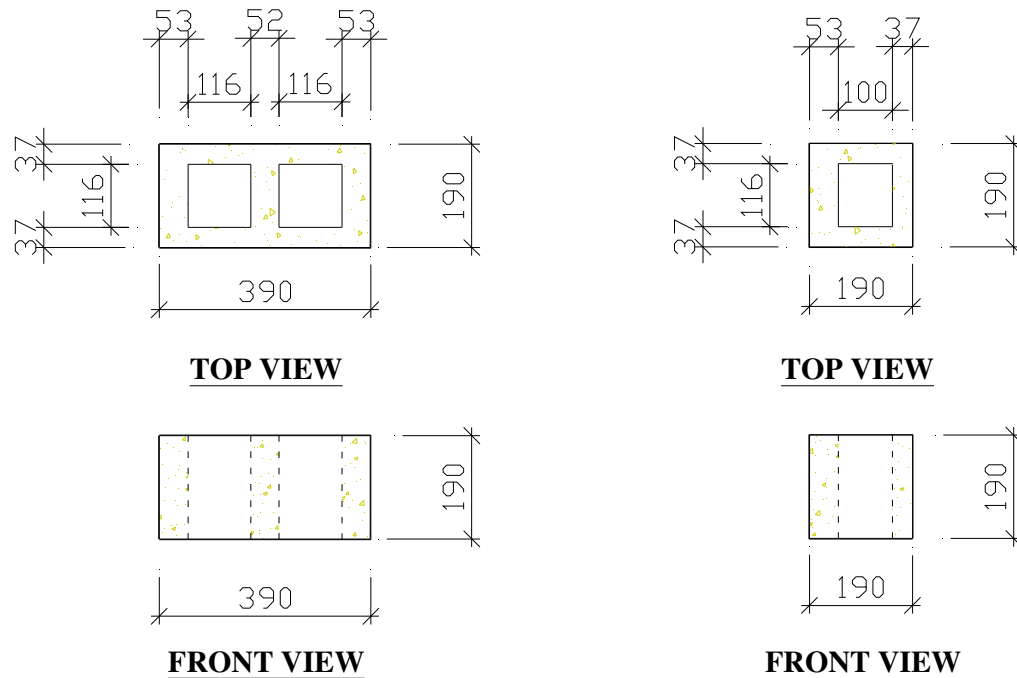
Standard full block and half-block concrete units (dimensions in mm).
